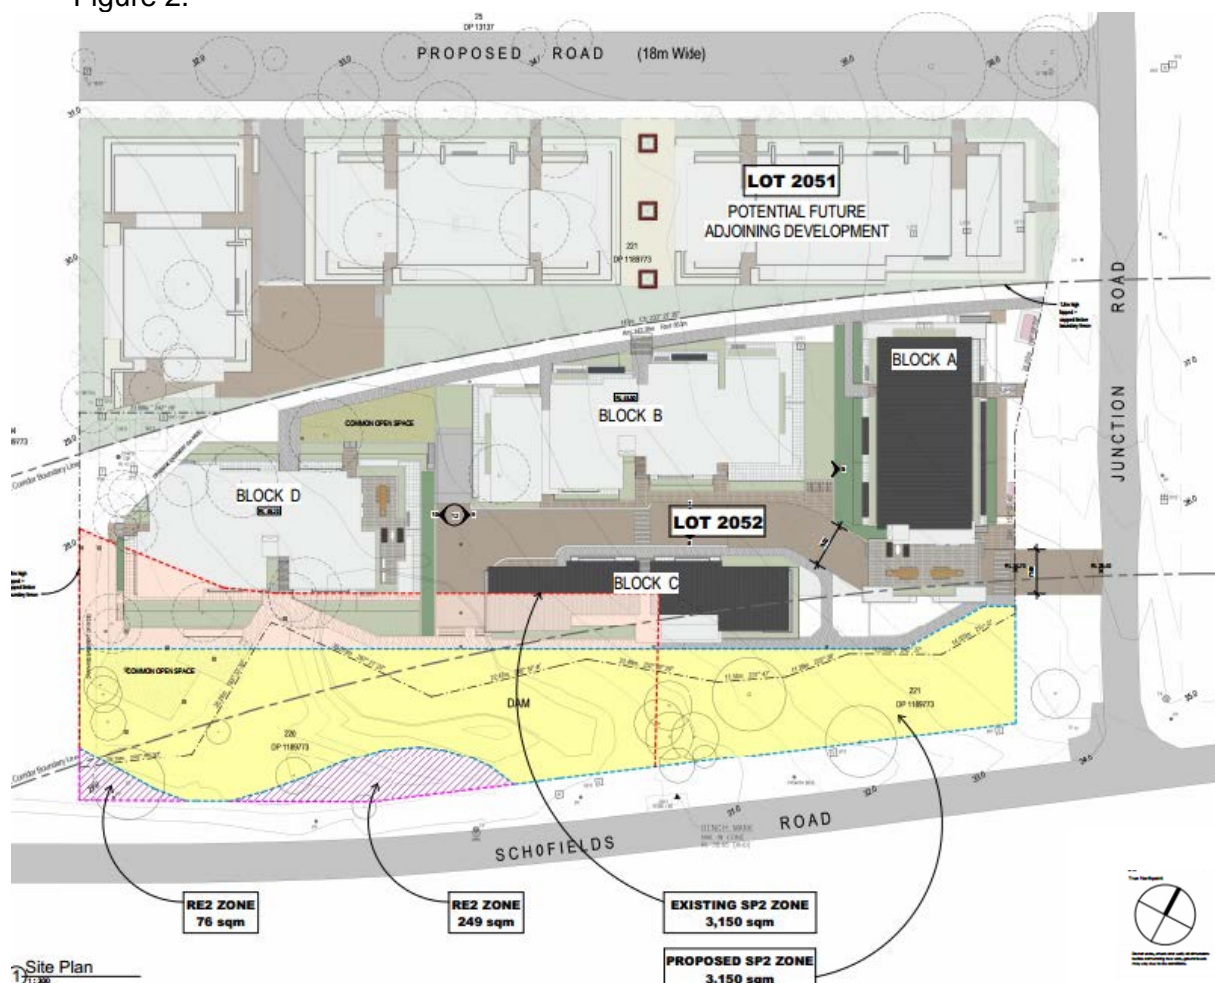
Site plan illustrating location of existing and proposed SP2 zoned land
